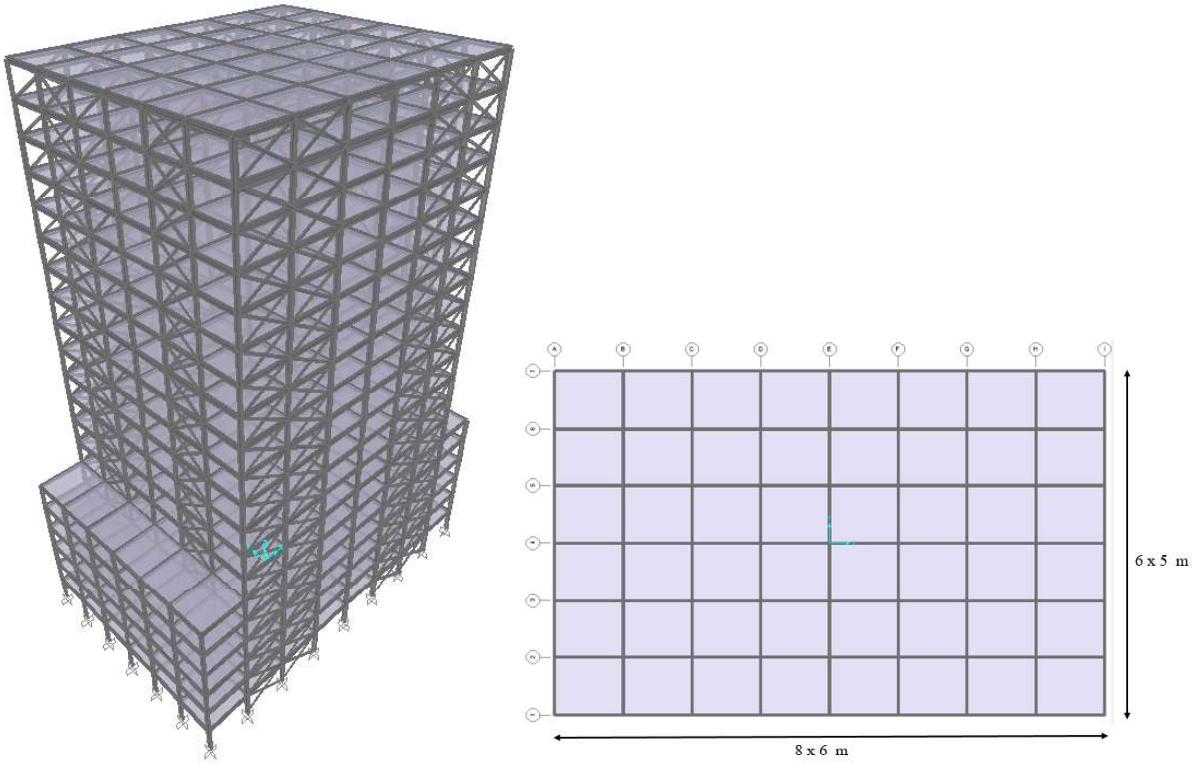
The schematic and plan views of the 20-story steel structure with 3860 members.
